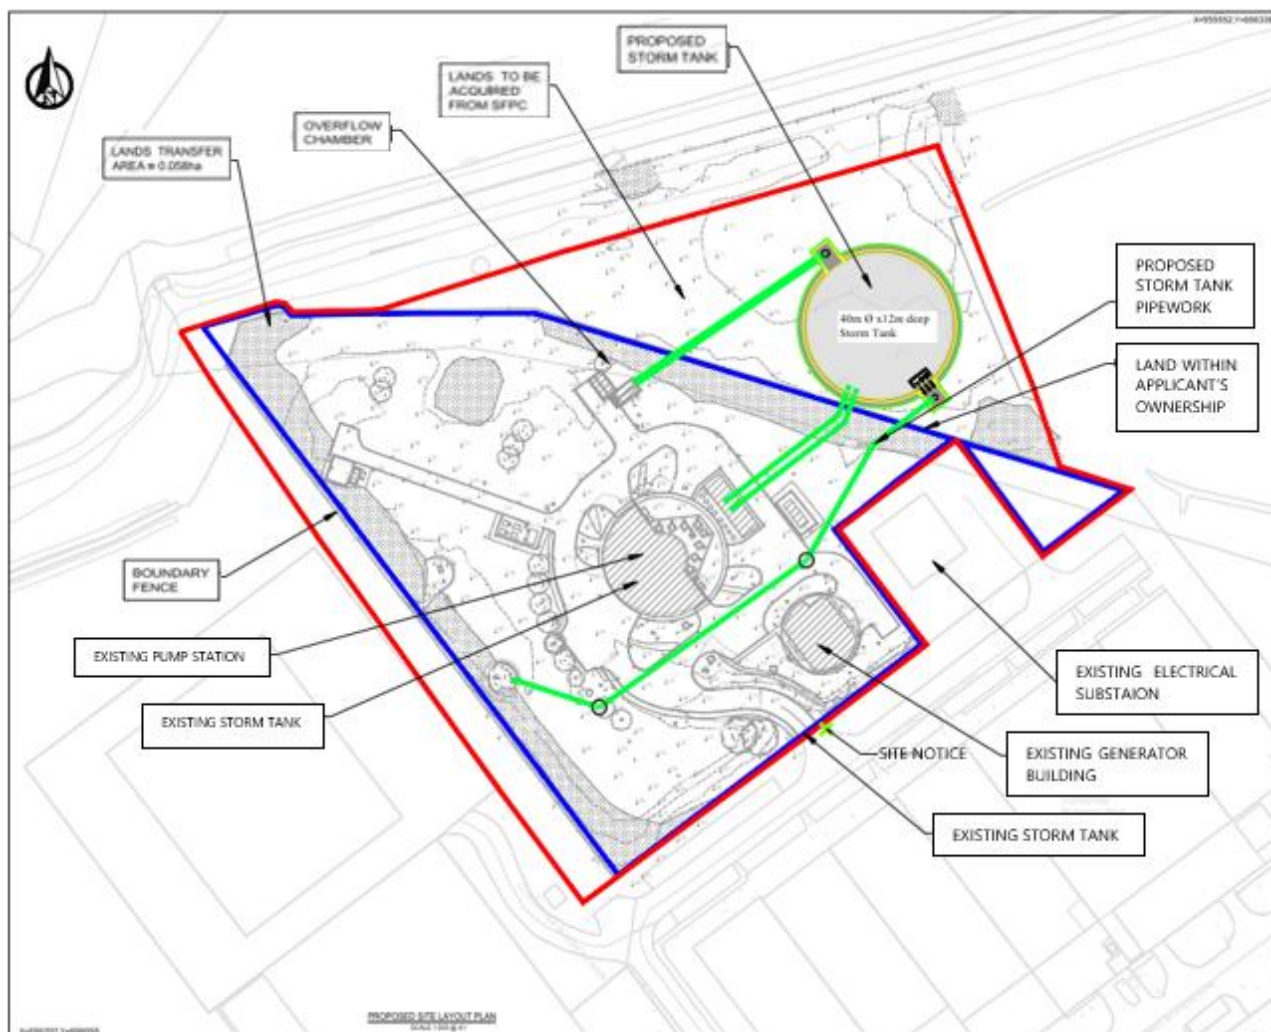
CORCANREE PS PROPOSED SITE LAYOUT
